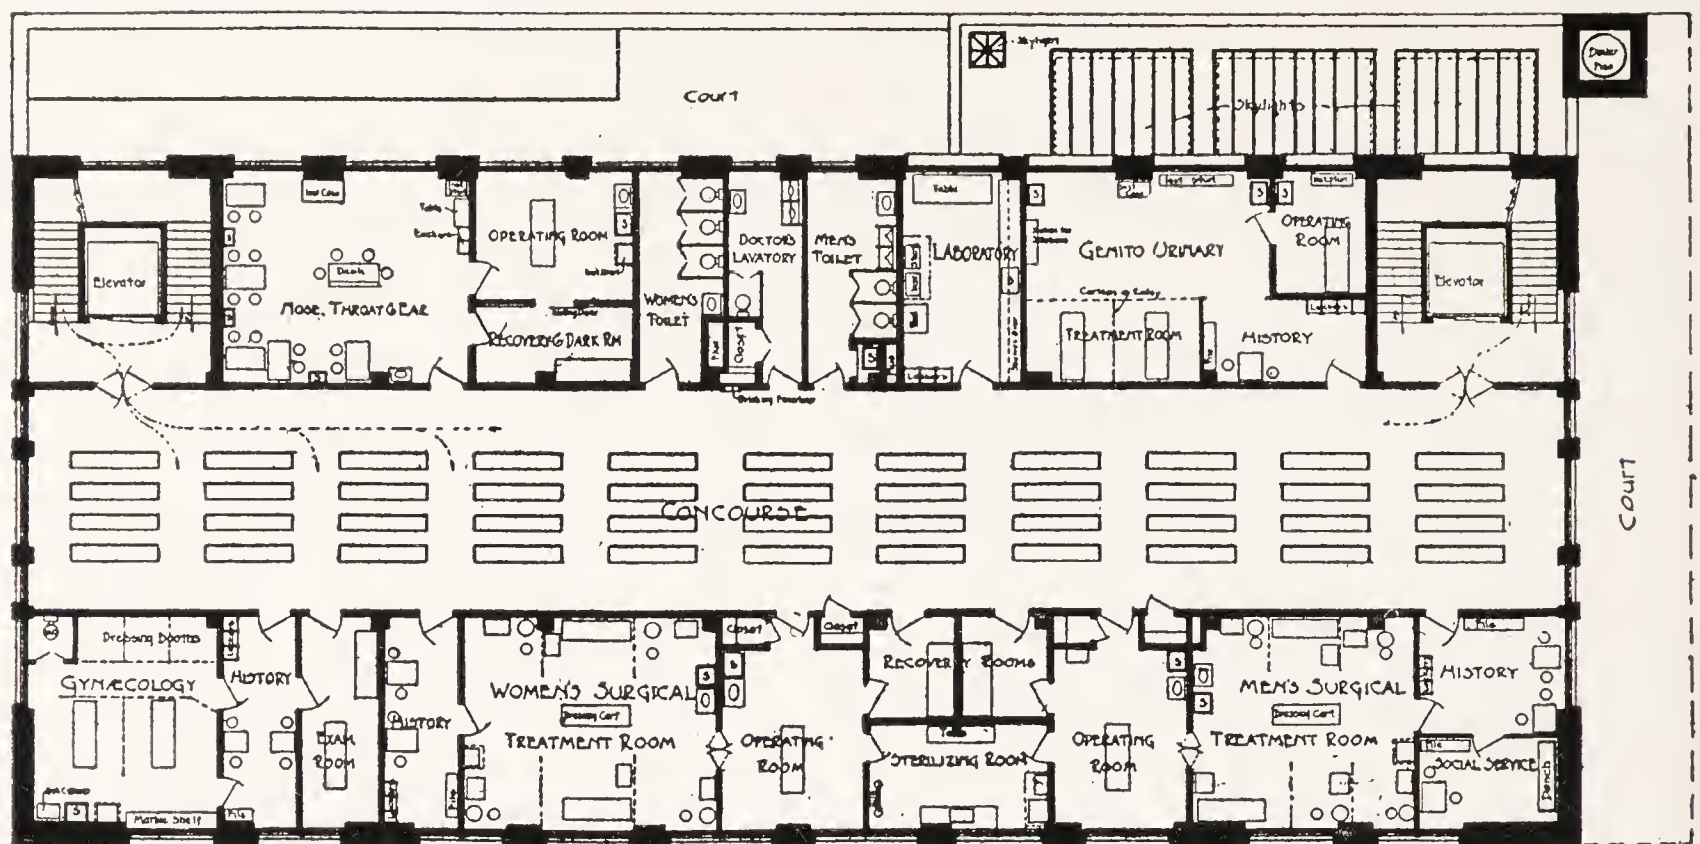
SECOND FLOOR, PROPOSED OUT-PATIENT DEPARTMENT FOR NEW YORK CITY
